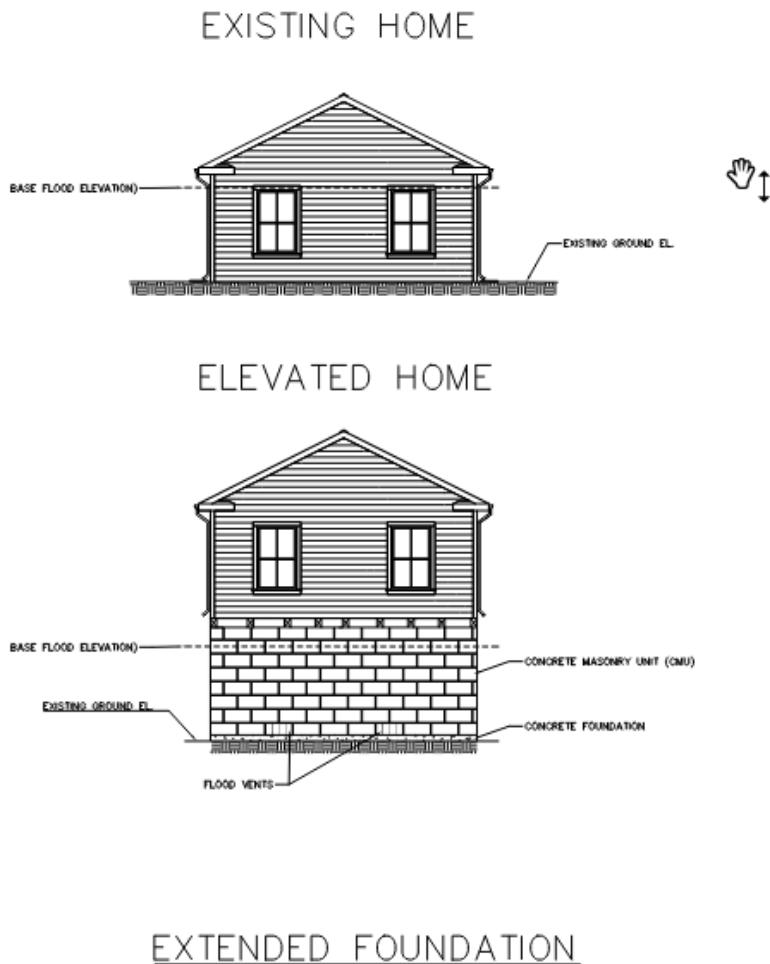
Home Elevation Concept Diagram – Extended Foundation
